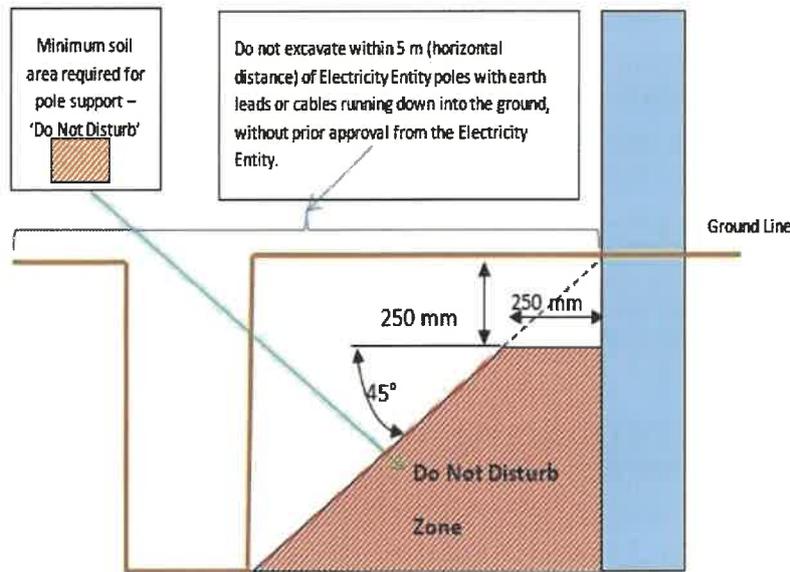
Do Not Disturb Zone requirements when excavating near poles
